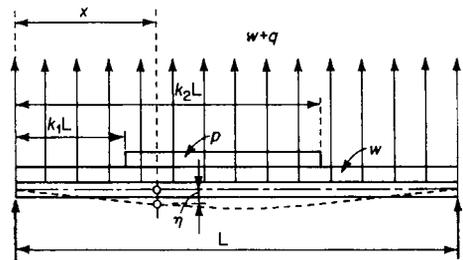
Forces acting on the truss of Fig. 15.41.
